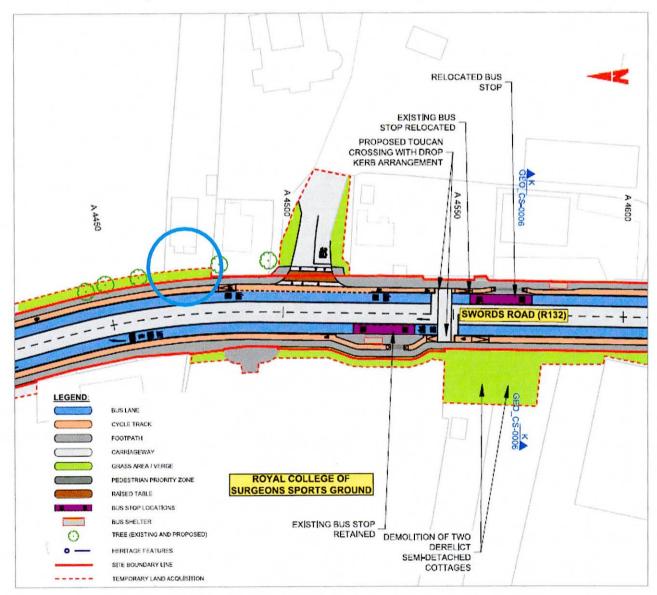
Extract of Sheet 13 of 37 'Swords to City Centre Core Bus Corridor Scheme - General Arrangement' (source: www.busconnects.ie, downloaded July 2023)
